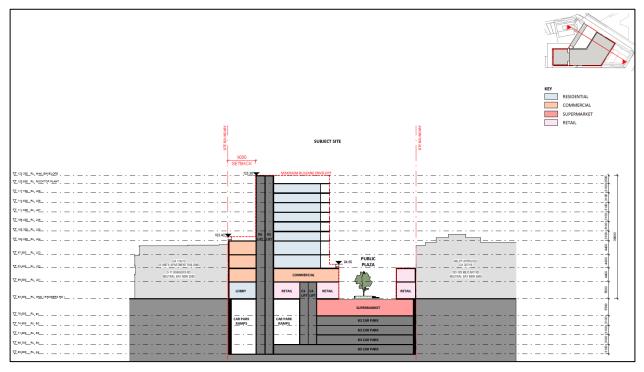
Proposed Rangers Road section (source: KTA architectural plans)
